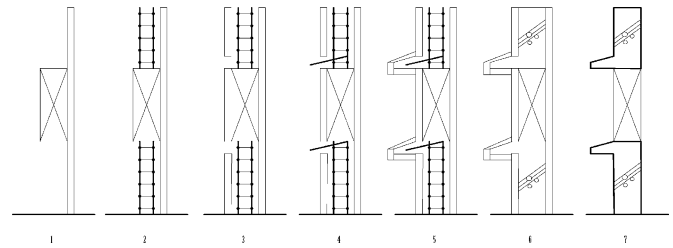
Original design for awning and external wall. Notes: 1) Internal form erection: Forms for the inner part of wall are erected. Window boxes are embedded in this step to shape the window opening. 2) Installing reinforcing bars for the wall construction: After internal forms are erected, rebar work for wall starts. 3) External form erection: Forms for the outer part of wall are erected. The window side should be cut for forming awnings at the next step. 4) Installing reinforcing bars for awnings: Reinforcing bars for awnings are set and anchored. 5) Awning form setting: After completion of this stage, wall is ready for concrete pouring. 6) Pouring and curing concrete: Concrete is poured into wall and awnings simultaneously and cured until it reaches the required strength. 7) Removing forms: Forms are removed and cleaned for the use of the next cycle once concrete reaches the required strength.
